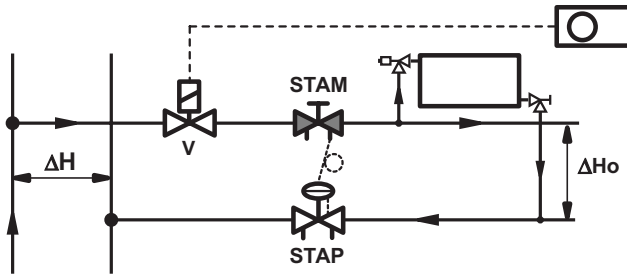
The control valve is situated upstream the measuring valve STAM.
